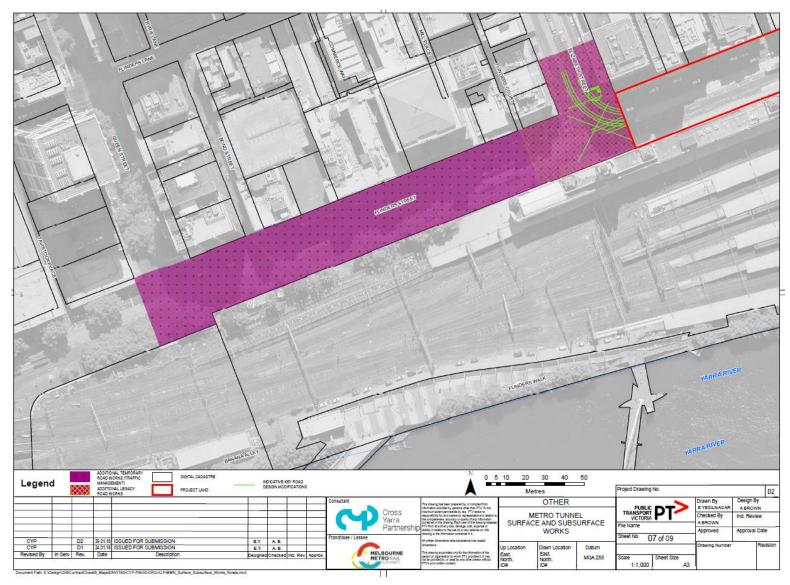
FLINERS STREET ADDITIONAL ROAD SURFACE WORKS
